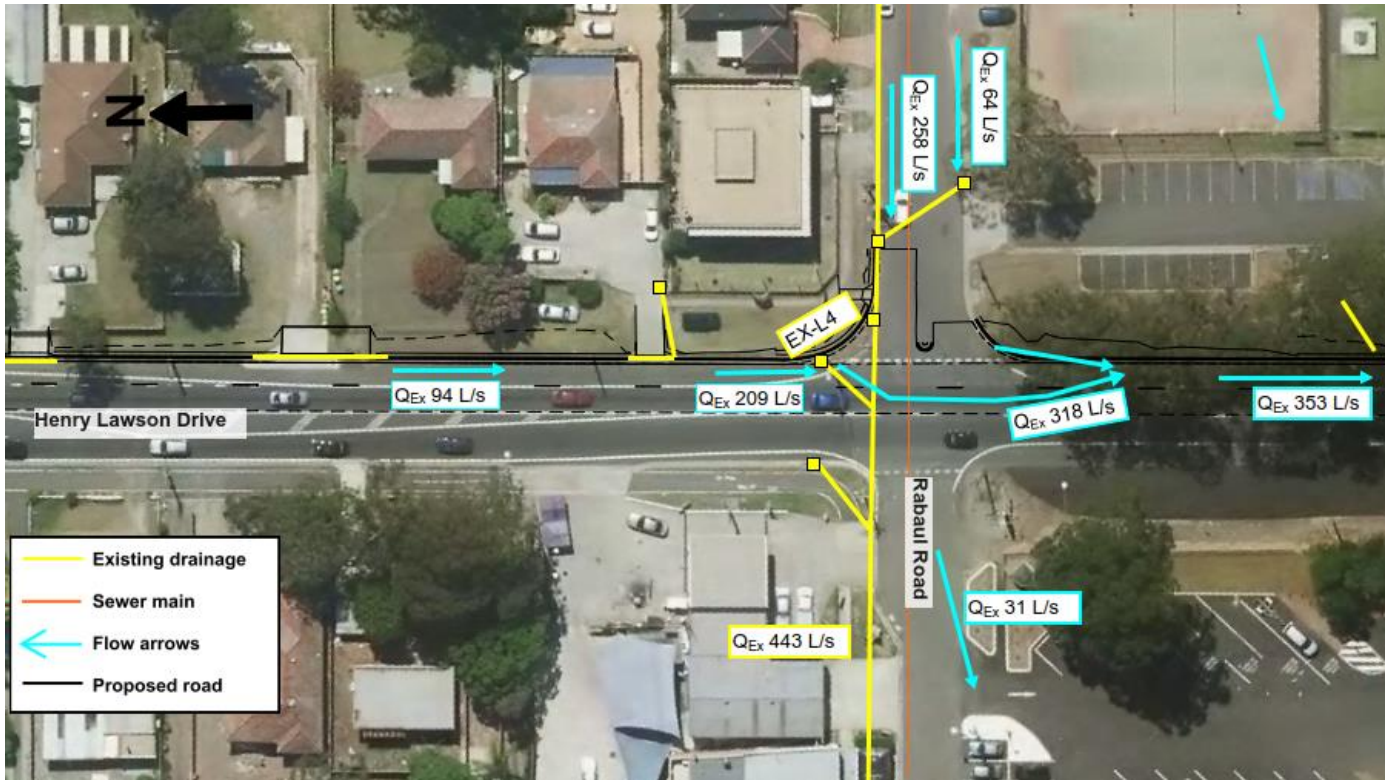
Henry Lawson Drive and Rabaul Road intersection network
